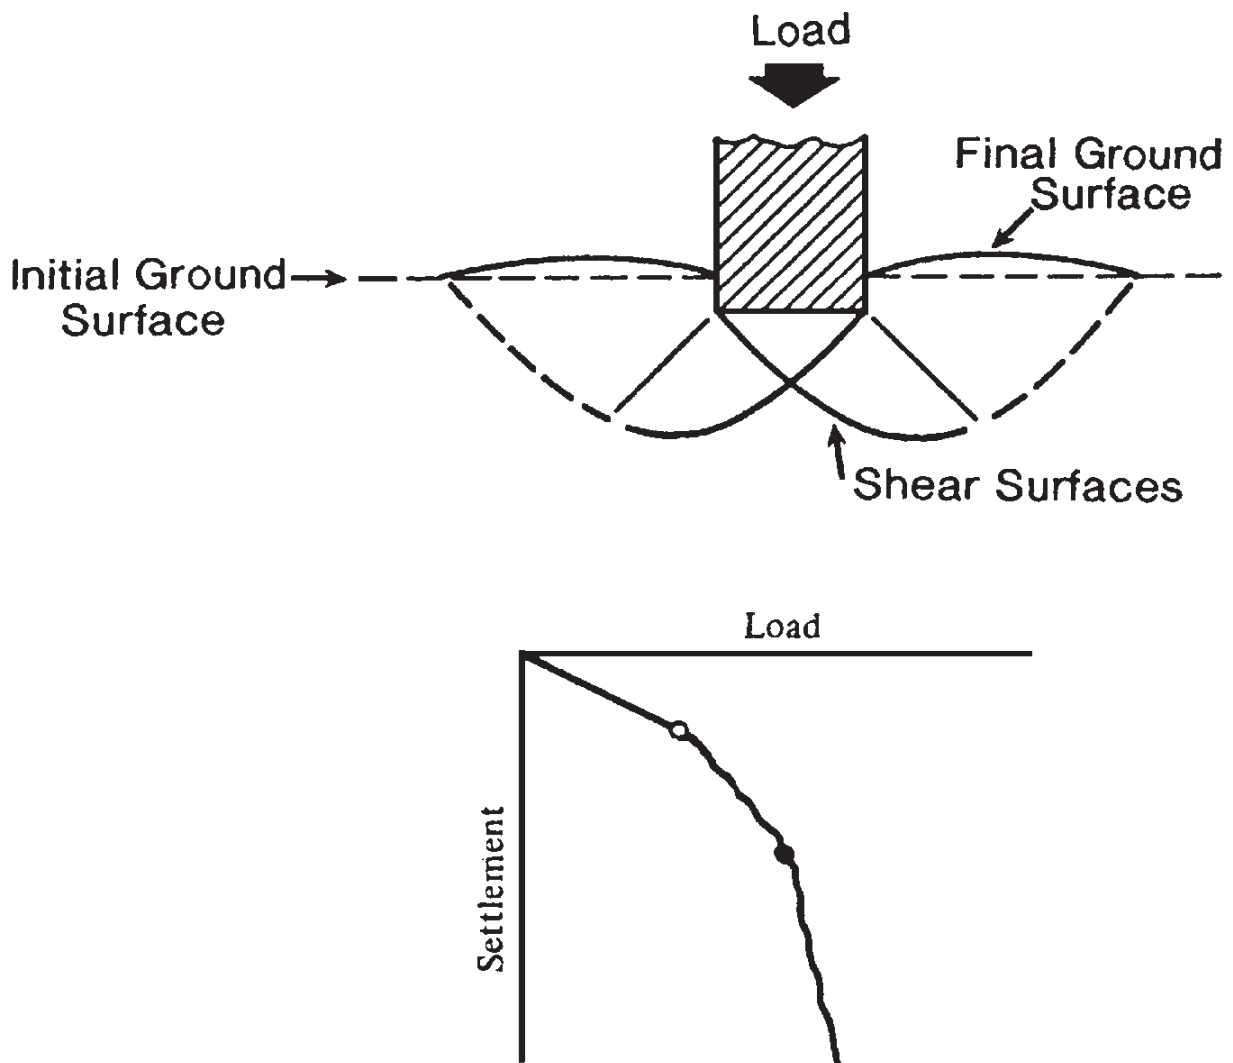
Local shear foundation failure. (After Vesic 1963.)
